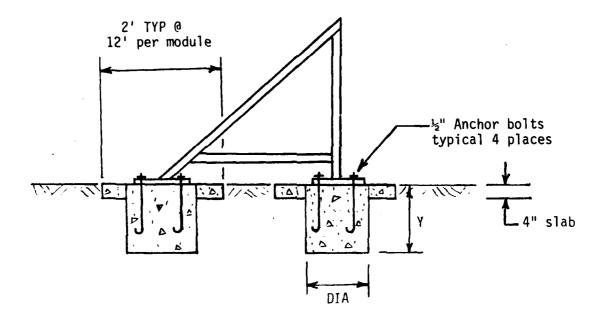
TYPICAL GROUND-MOUNTED COLLECTOR SUPPORT
